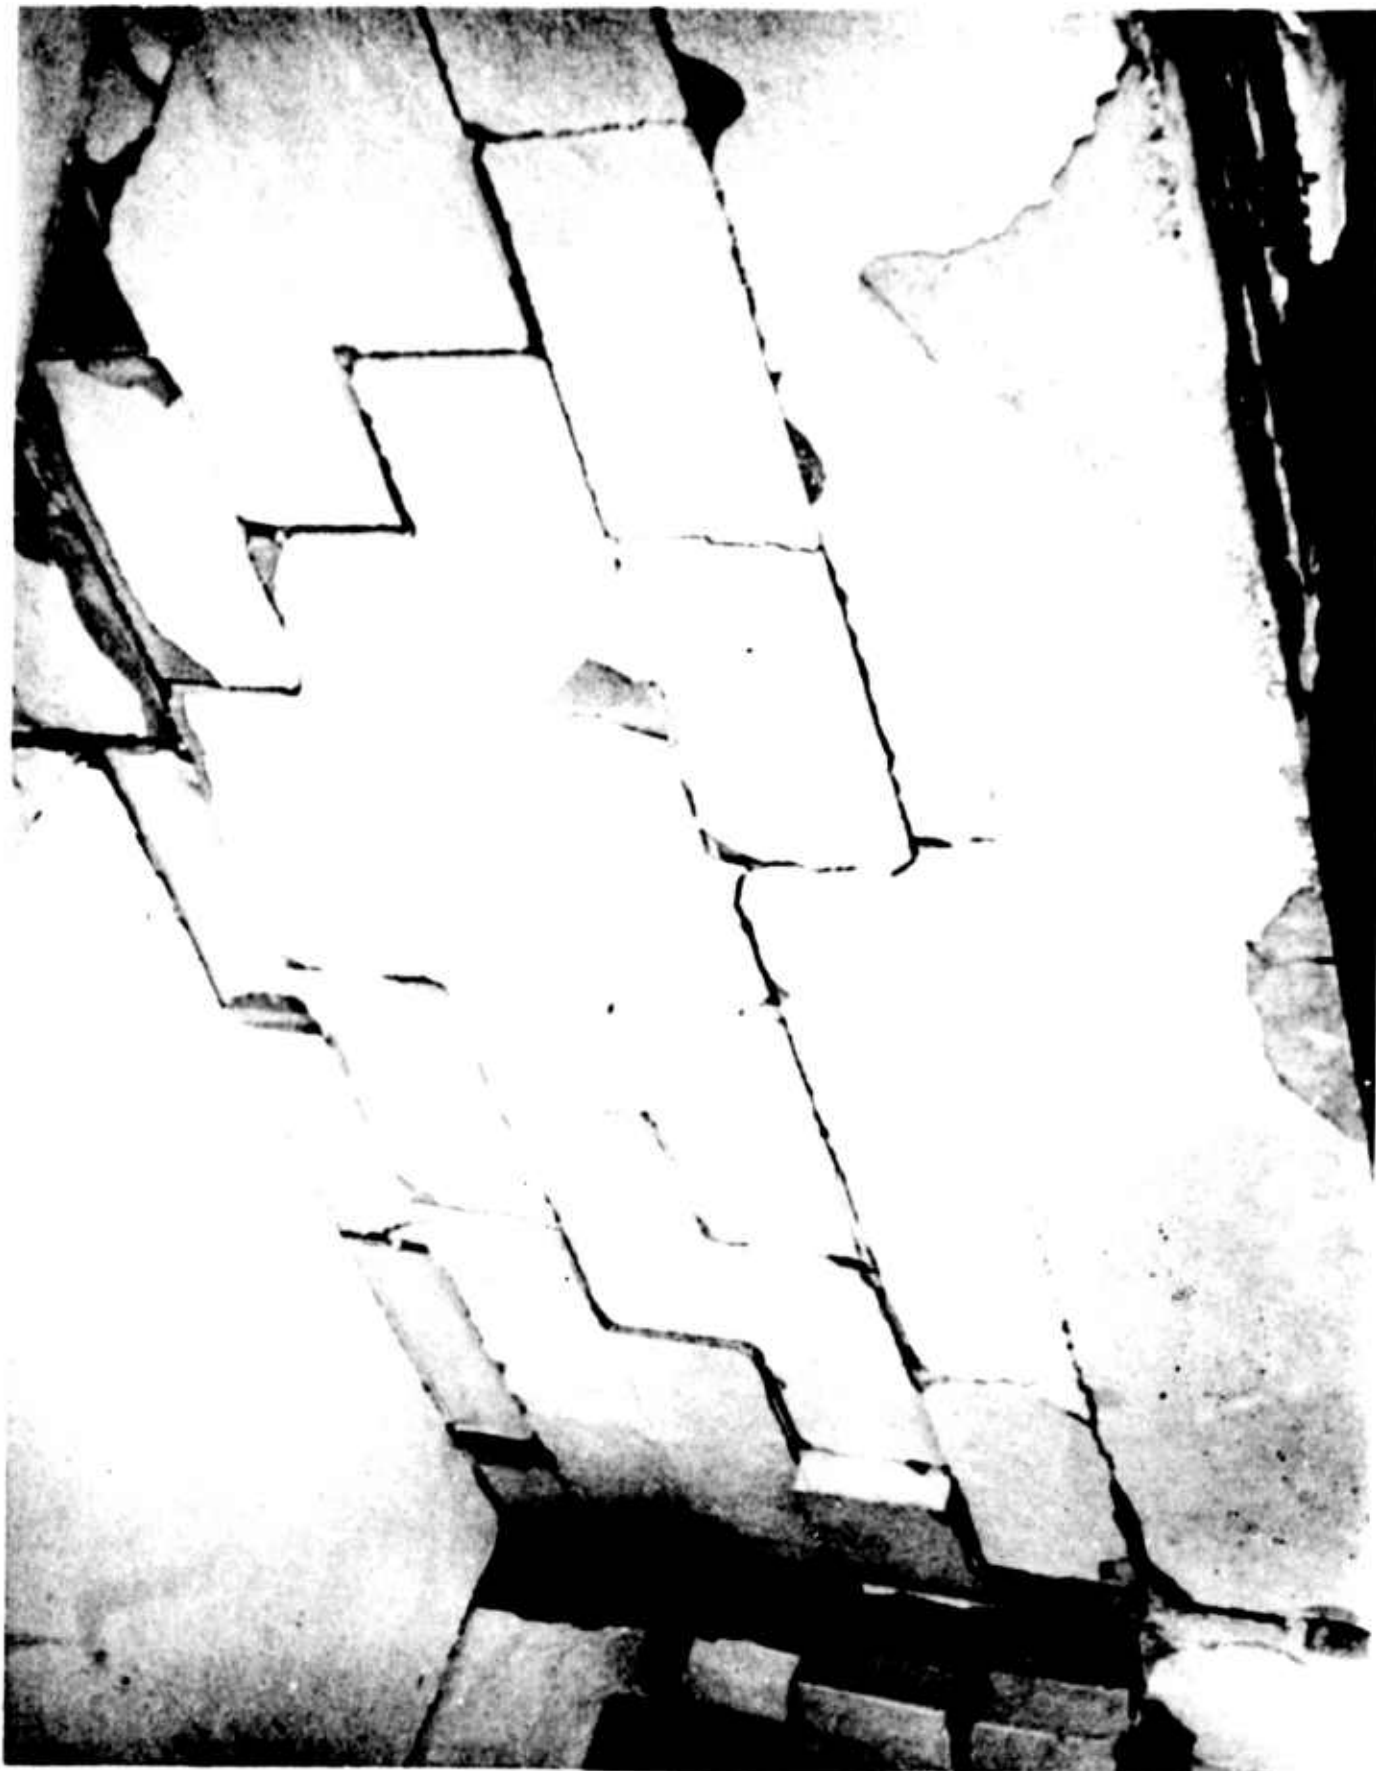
Hillside Apartments (Typical crack pattern of interior masonry-block walls)
